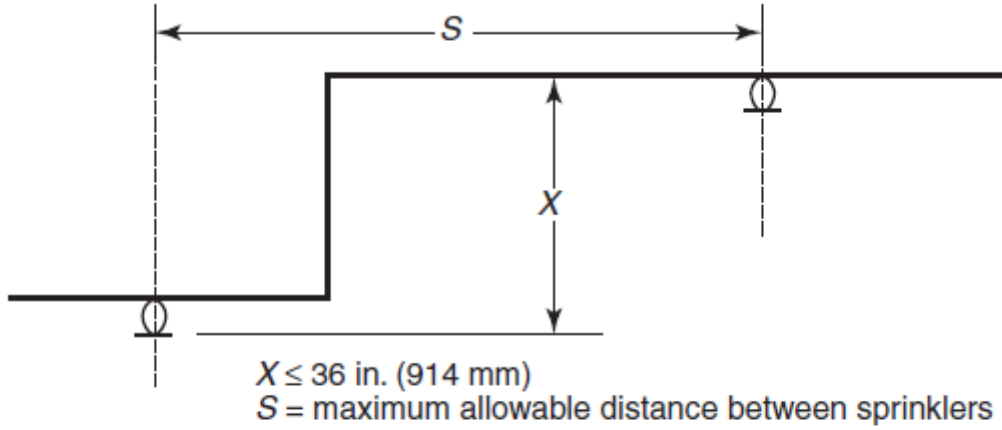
(A) Vertical Change in Ceiling Elevation Less Than or Equal to 36 in. (914 mm).
